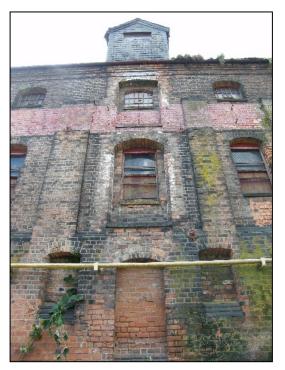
Location of the former hoist and associated doorways on the south-east elevation, viewed looking north-west.
